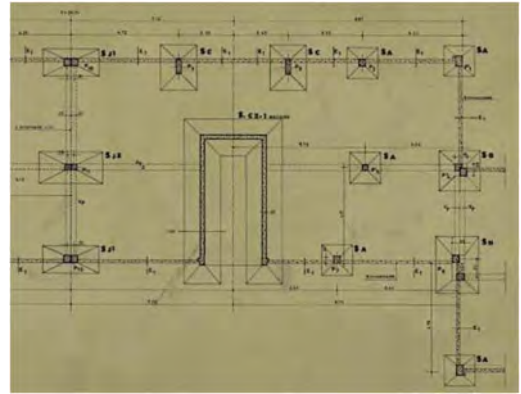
Lagarteiro II*. Detail of the foundation plan. 1976. Calculation: Rui Paixão © Arquivo Municipal do Porto.
